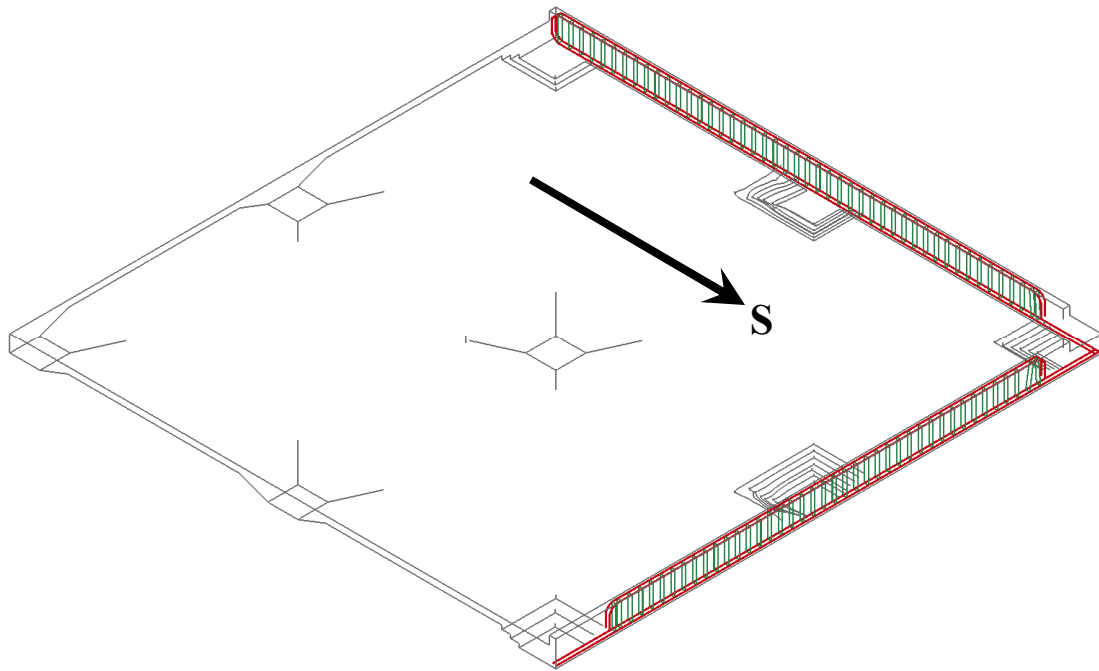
Isometric view of the beam rebar, red-#4 longitudinal rebar, and green-#2 shear stirrups. An outline of the concrete model is shown in grey.
